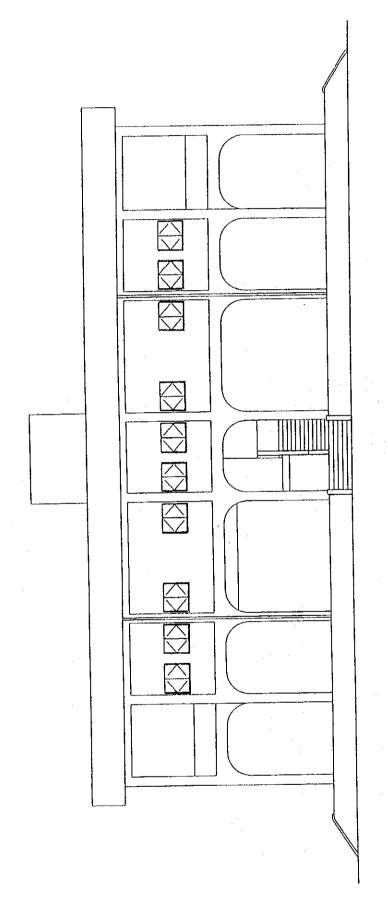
(4) ELEVATION (5-CLASROOM TYPE)
